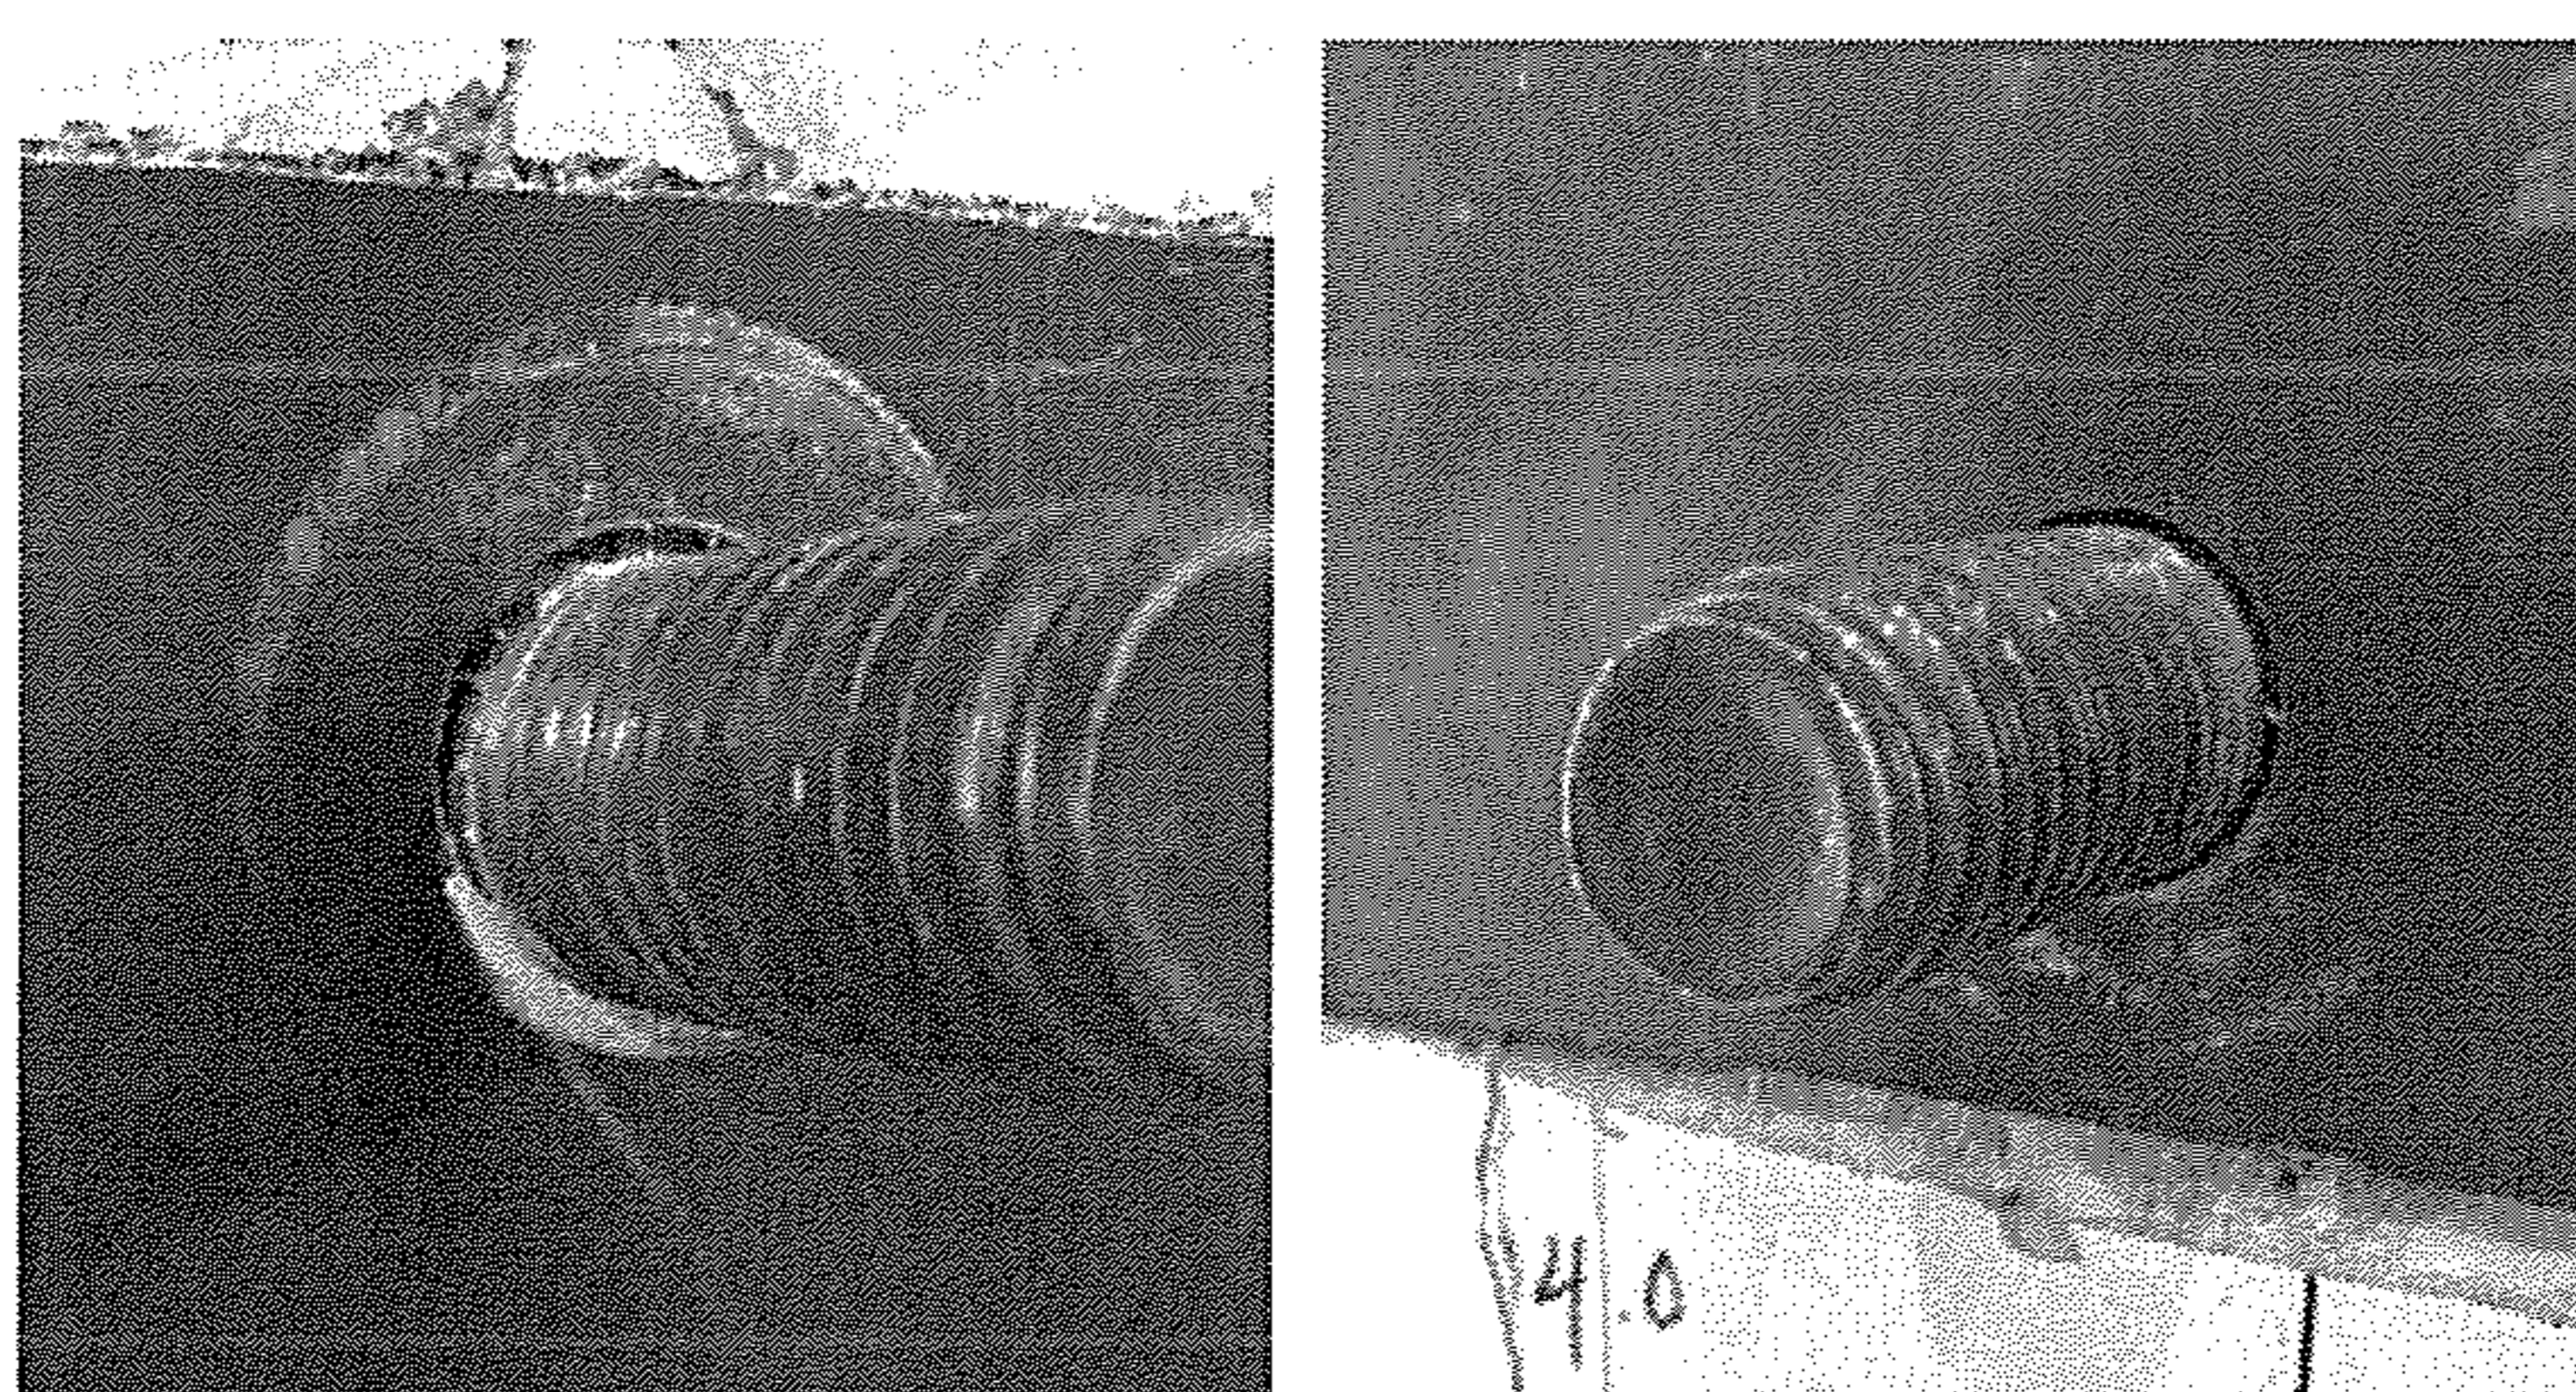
Gap between bolts and steel plates after replacing damaged plates
